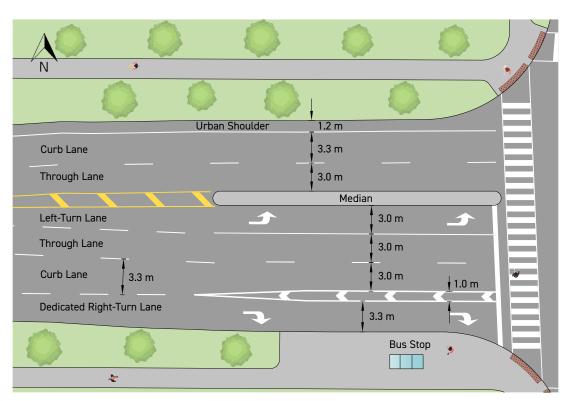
Example 2 - Configuration of Proposed Lane Widths
